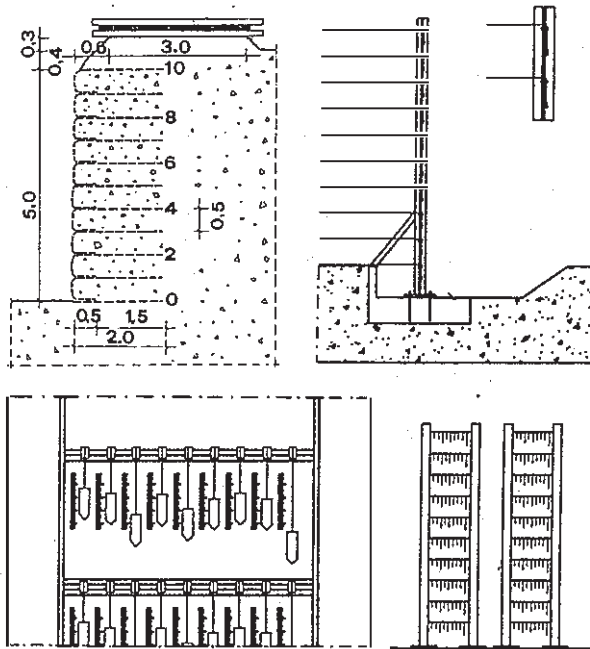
Cross section of wall through the reinforced section and sketch of reference system used to measure reinforcements elongations.
